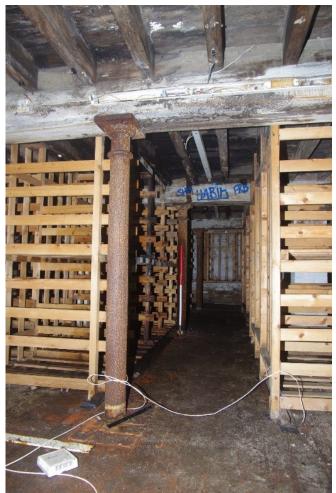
Building N basement/ground floor Looking north-west from Building N to space below Building Q. 1m scale
